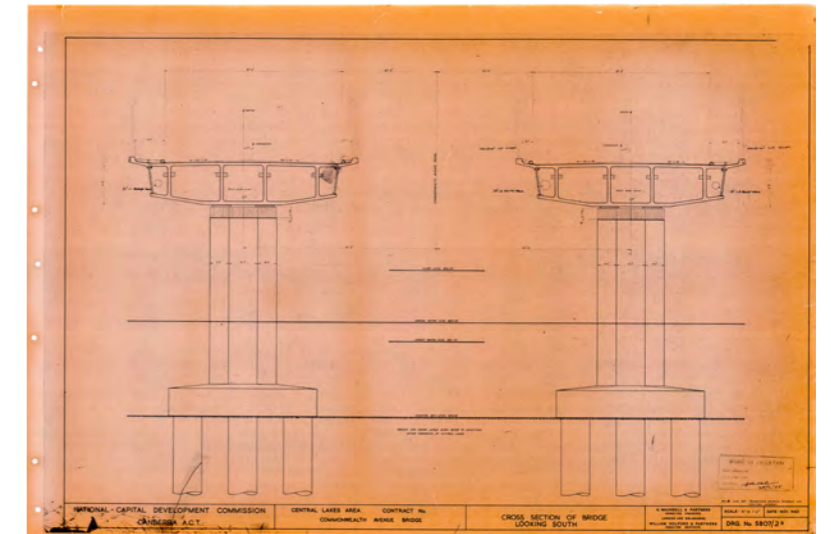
Commonwealth Avenue Bridge, Cross Section of Bridge, G Maunsell & Partners and William Holford & Partners, DRG No. 5807/2B.
